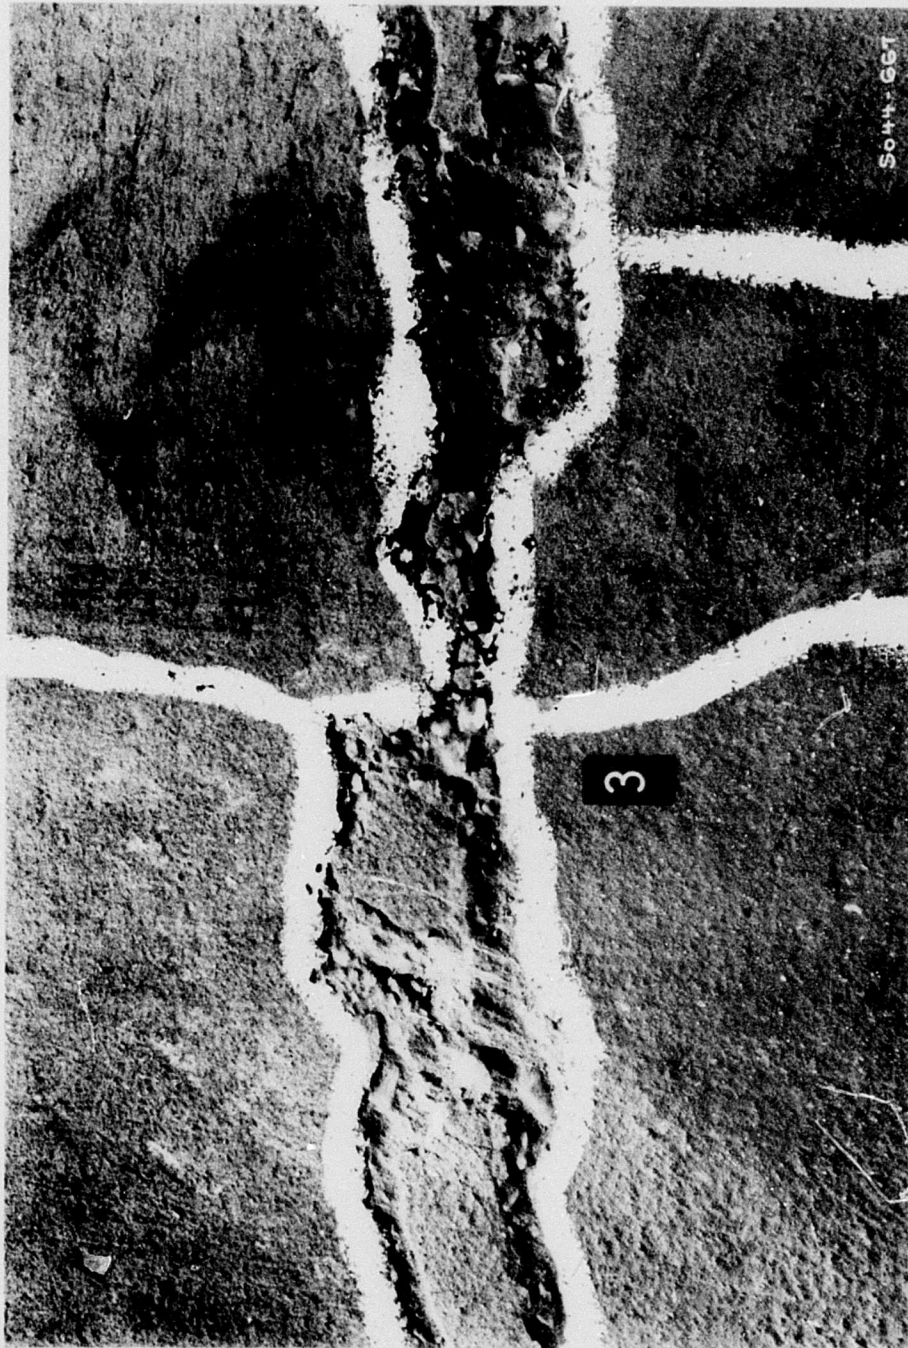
Spalling and flaking along cracks in item 3, 360-kip, 12-wheel-assembly lane after 504 coverages.
